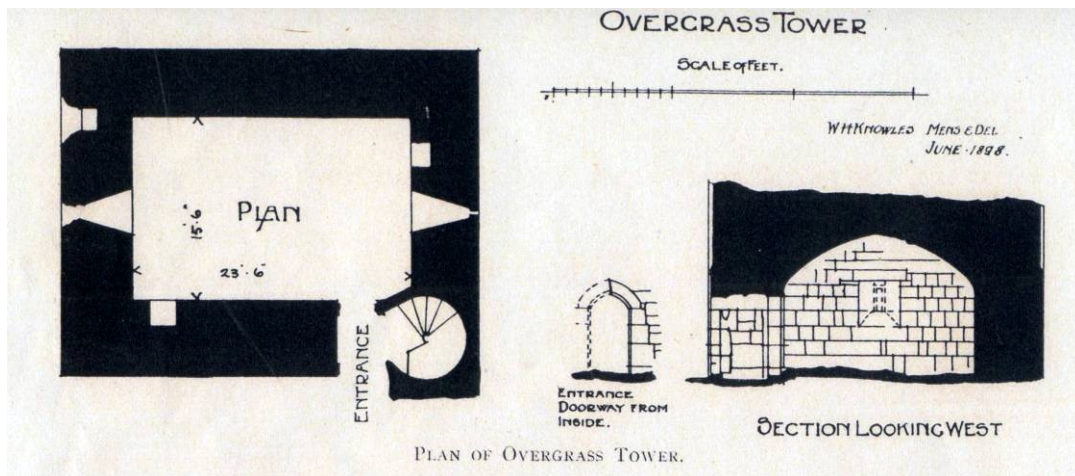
WH Knowles' 1898 plan and sections of Overgrass Tower.
